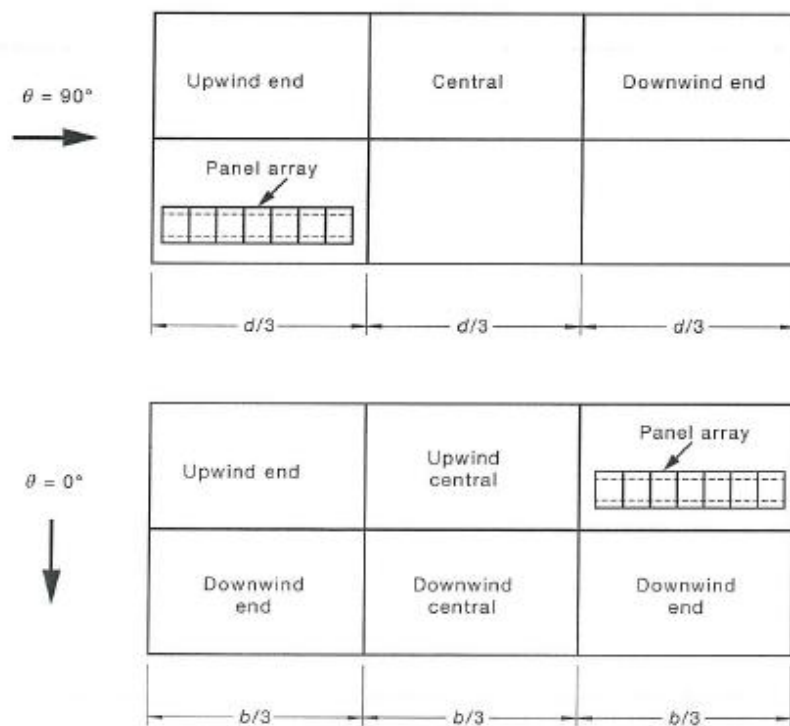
ROOF ZONES FOR PANEL ARRAY
